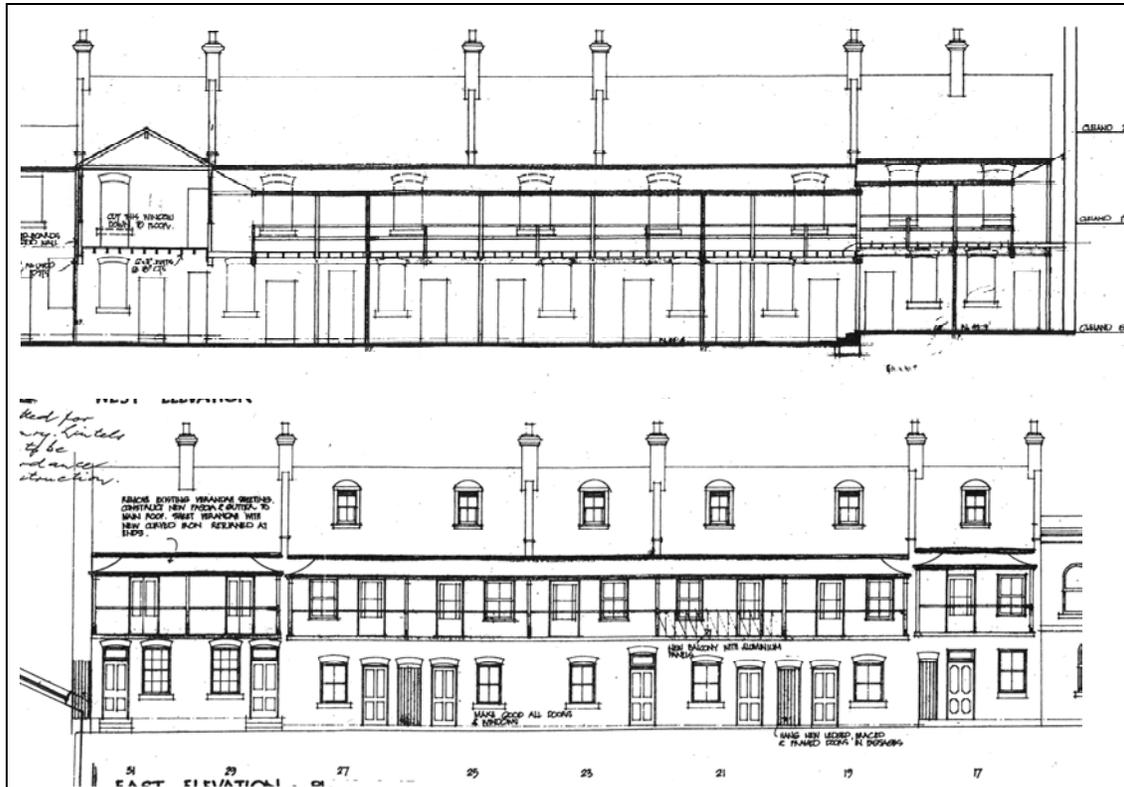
Elevations prepared by Fisher Jackson Hudson Architects indicating 1972 works. (Source: City Archives 1383/71)
